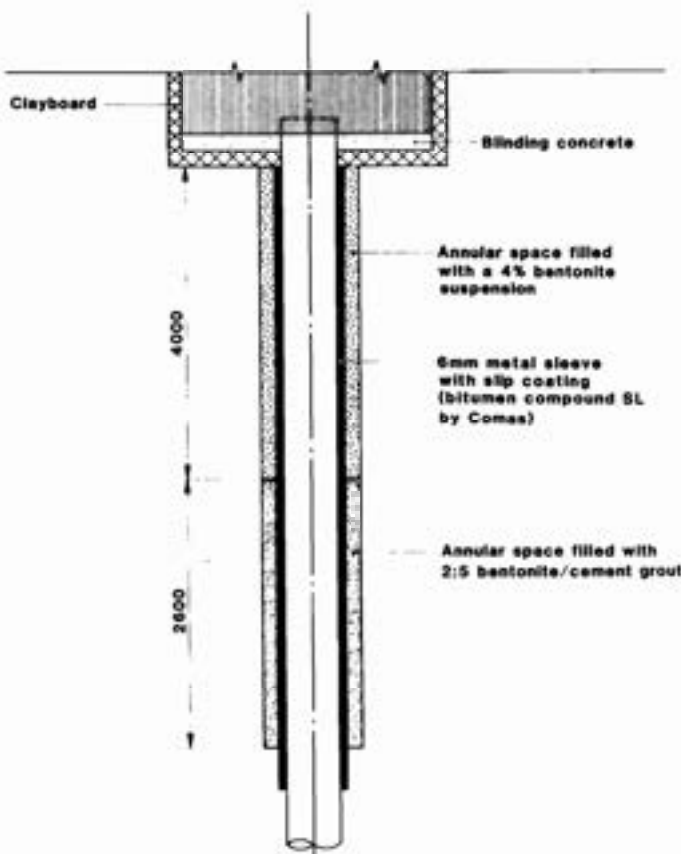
Detail of sleeved pile adjacent to TWA sewer
